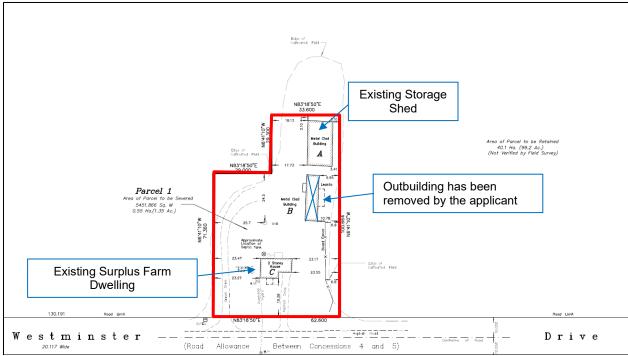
Proposed Site Plan (Lot area outlined in red is proposed to be rezoned as part of this application)
